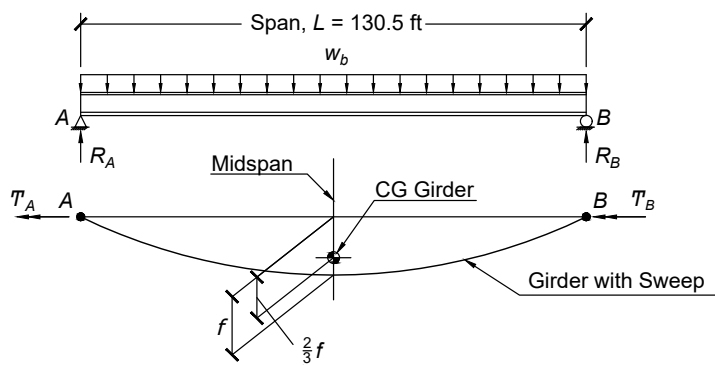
SCHEMATIC ELEVATION AND PLAN VIEWS
